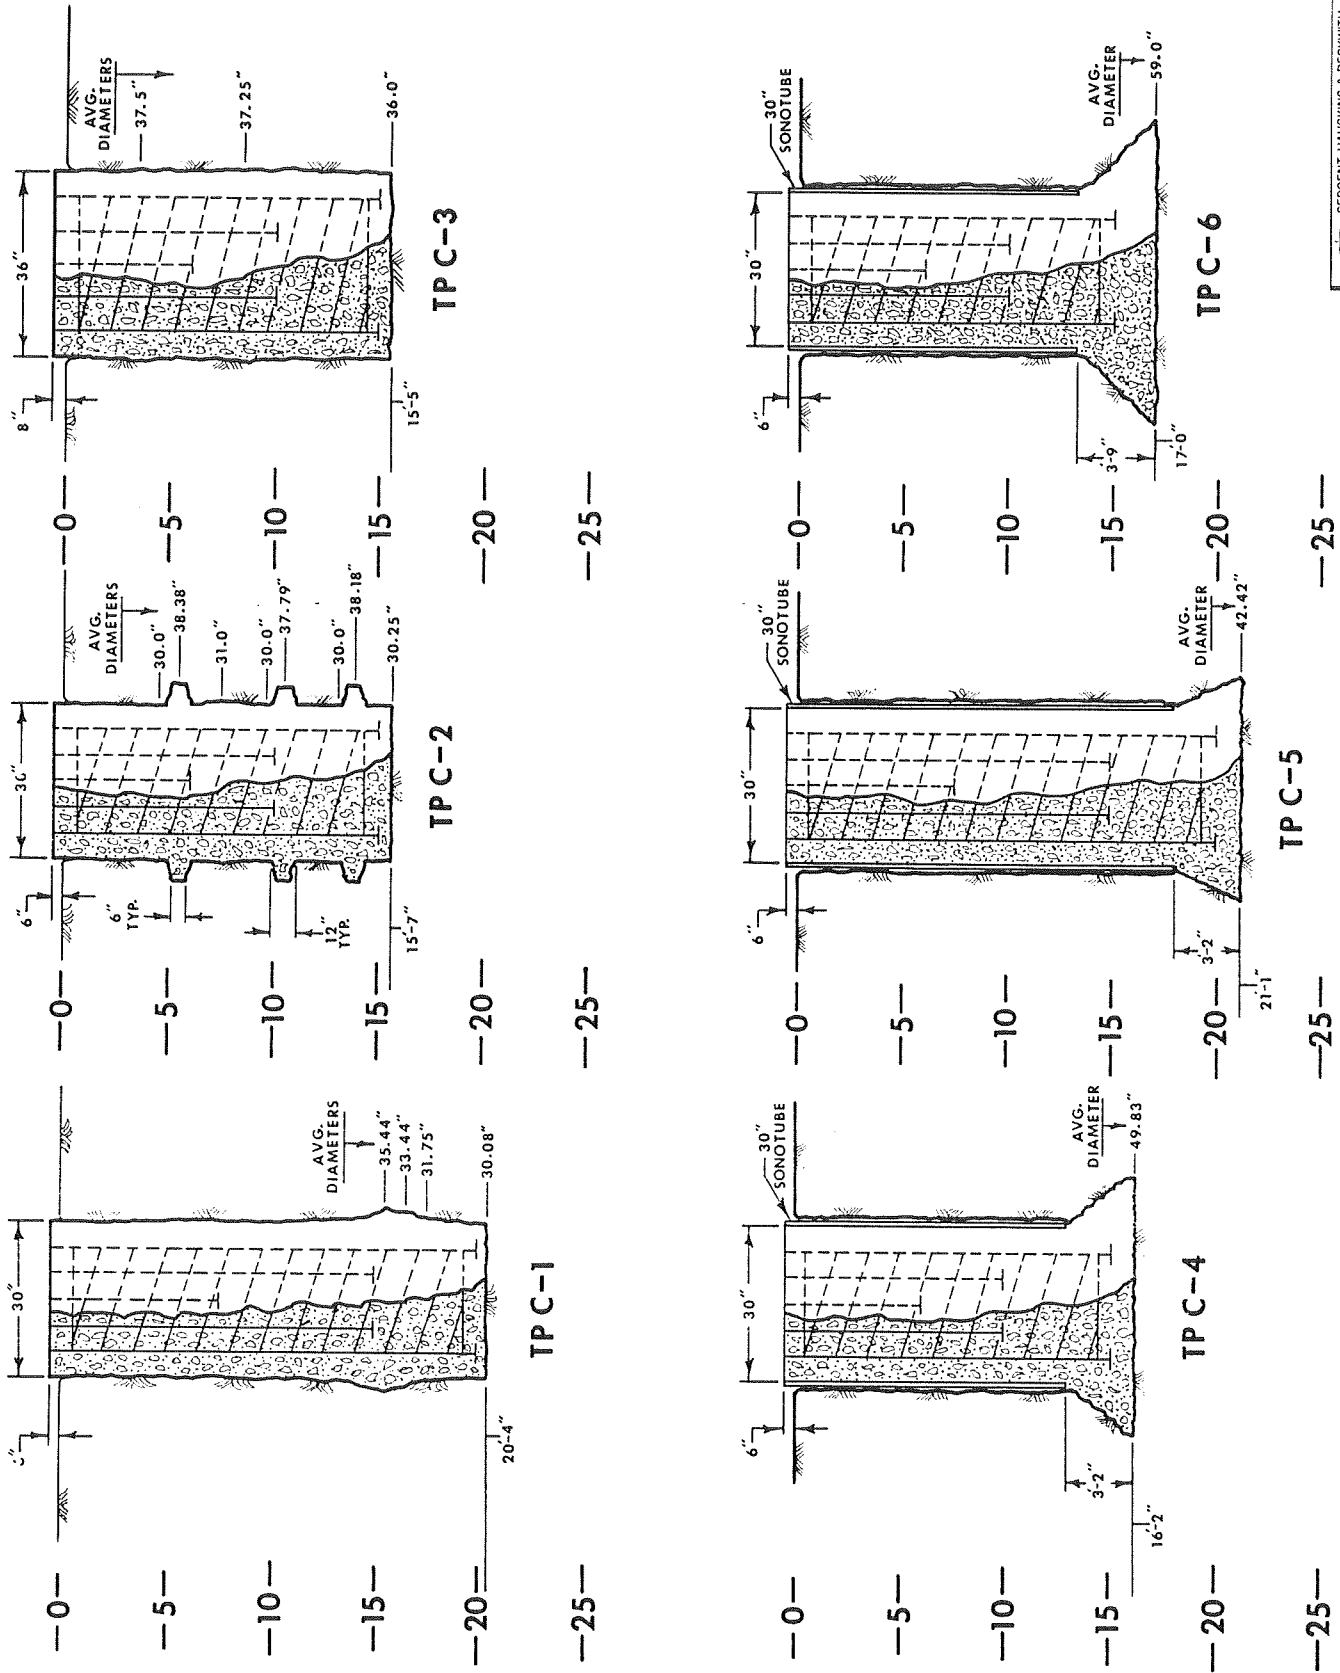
SCHEMATIC OF TEST PILES - SITE C
